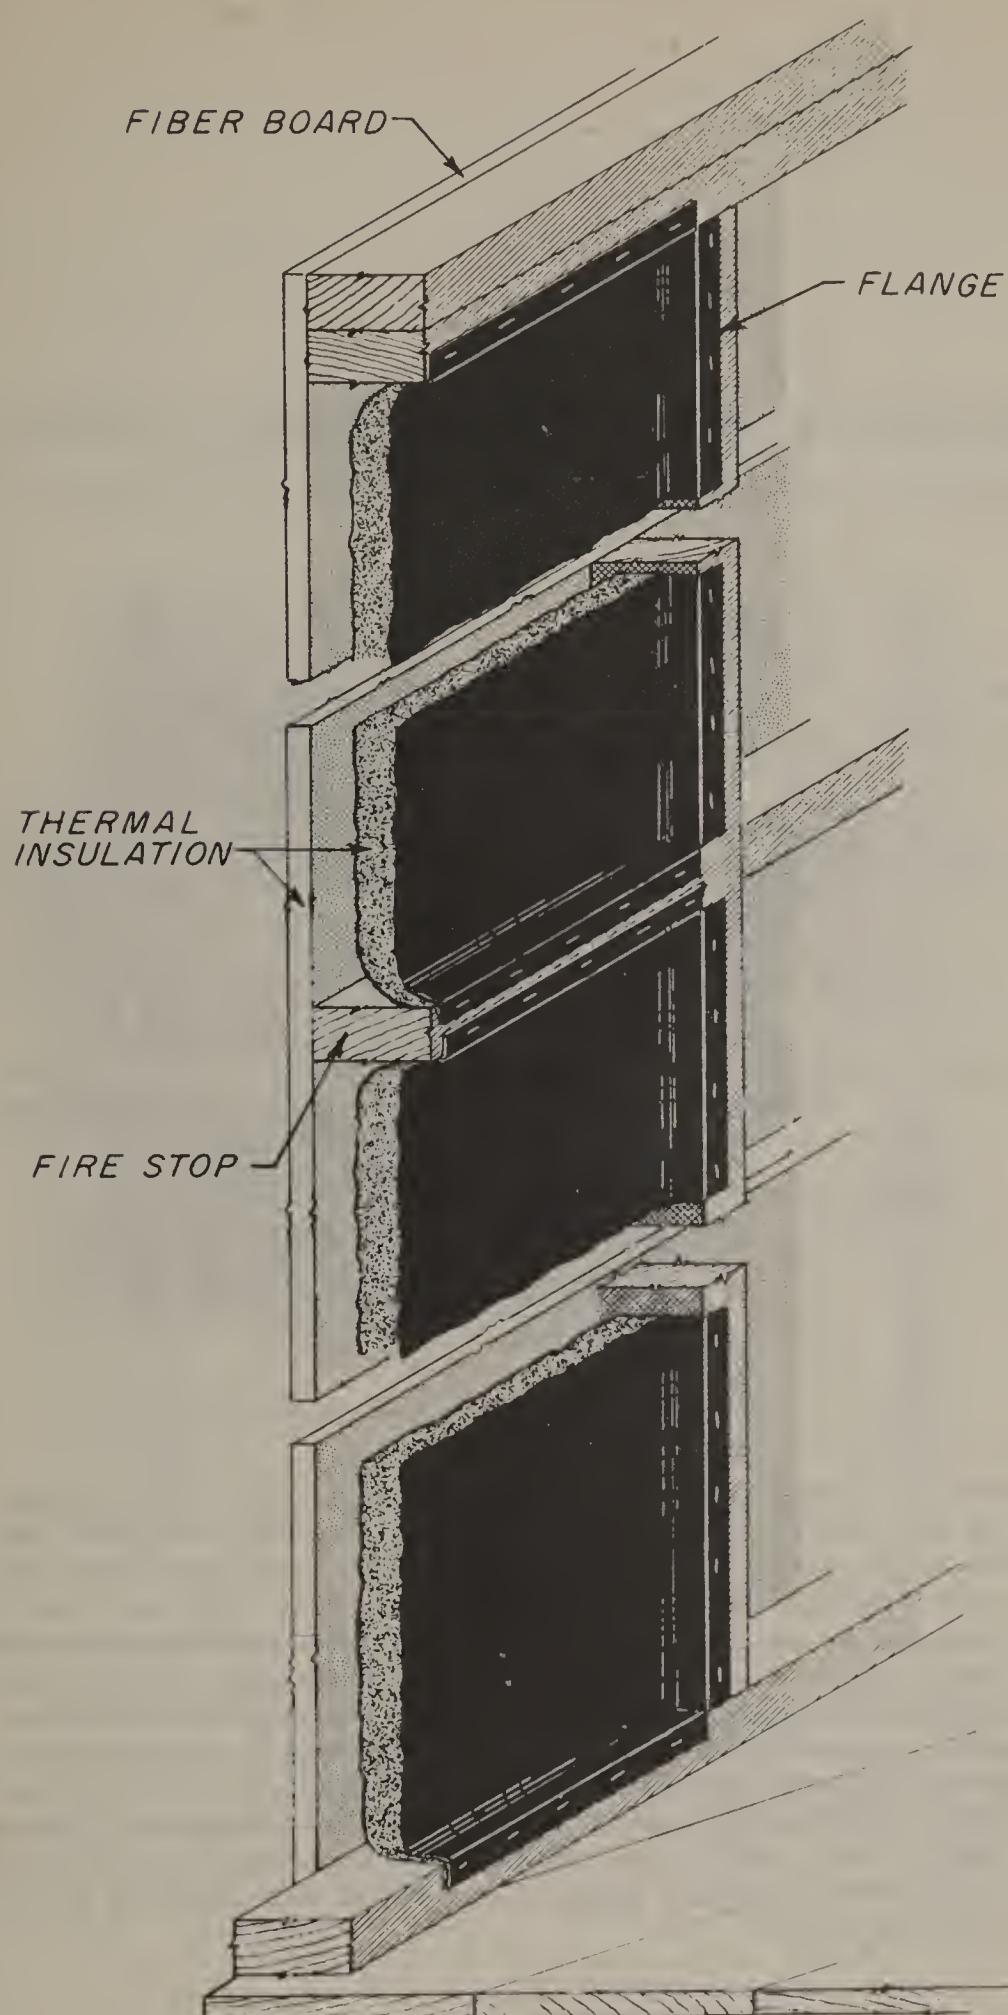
Wall detail, blanket insulation attachment.* To obtain the most effective use of blanket insulation in condensation control the flanges of the insulation should be stapled to the studs. About $1\frac{1}{2}$ inches of blanket should be allowed at each end for sealing purposes. In order to bring the covers of the blanket together, the fiber along the ends of the blanket should be removed. The thermal insulation indicated consists of low density fiber, two air spaces, and fiberboard sheathing.
